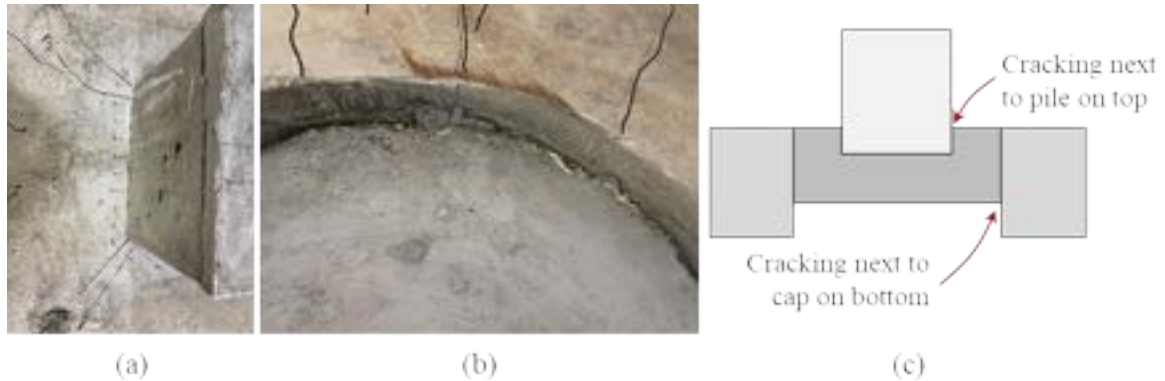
Location of cracking in socket specimens, SC-1 shown, (a) on top next to the pile, (b) on bottom next to the cap, and (c) schematic highlighting location of cracking
